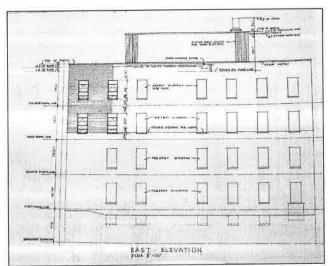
East elevation and penthouse profile (view west) (Gerald Griffith, architect, July 1956, in the possession of the building owner)
